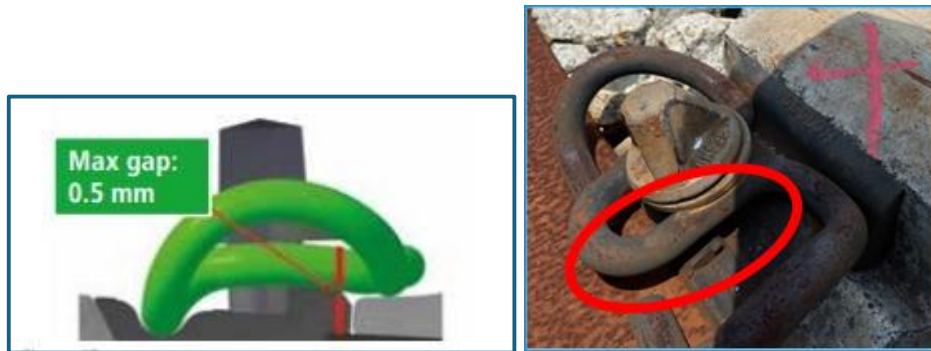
Air gaps in fastening system at Section 3, Paloh – Renggam
